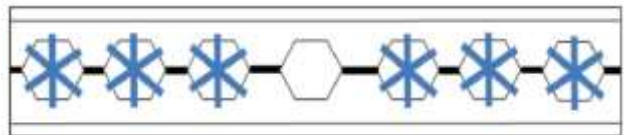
Stiffeners in Three Successive Web Openings at the Beam Chassis Specimen
